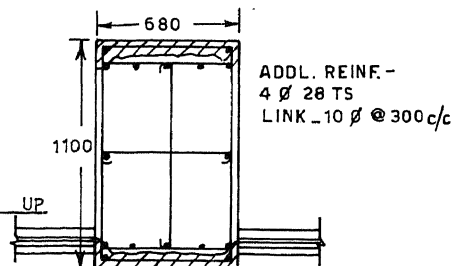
BUILDING UP BEAMS/COLUMNS FROM TWO SIDES - CASE III
